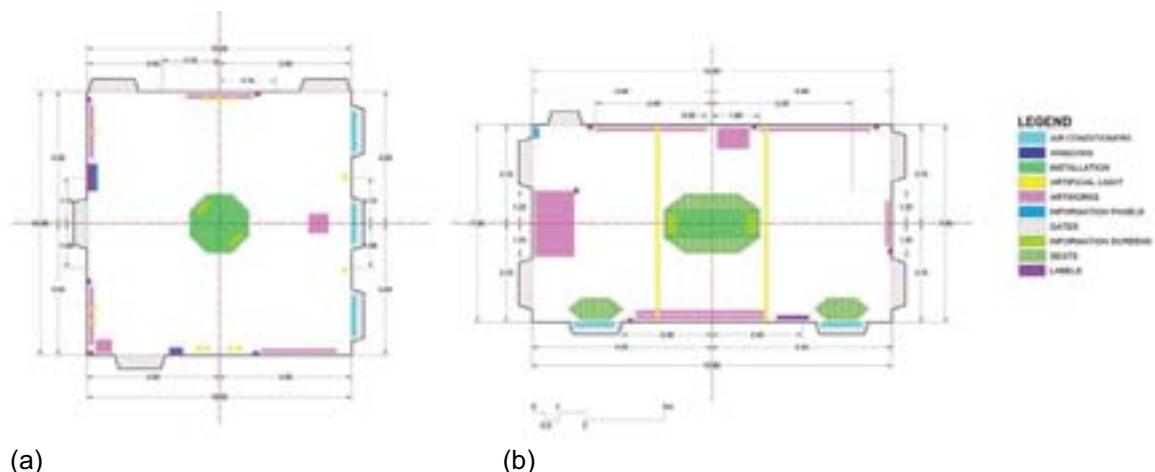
Plans of Room1 (a) and Room 6 (b).
